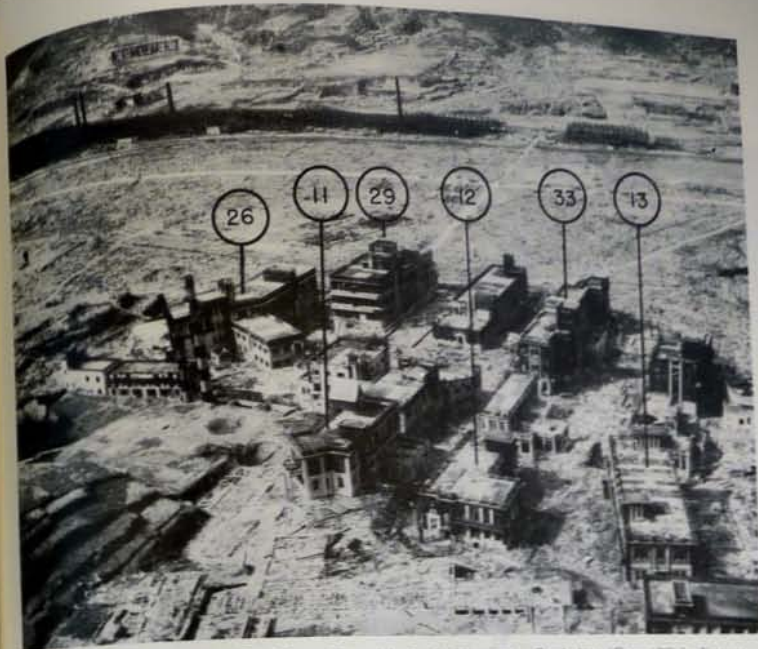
2,200 feet from GZ. Group 20, aerial view looking west. Steel plant (Group 26) in distance.
